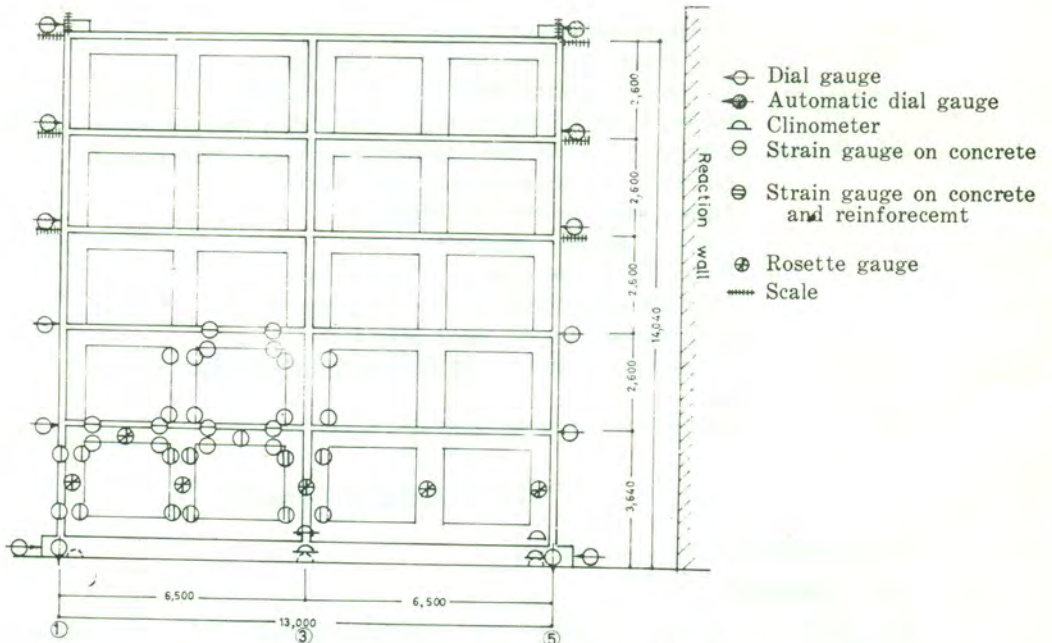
Elevation and positions of apparatus (A-frame)
